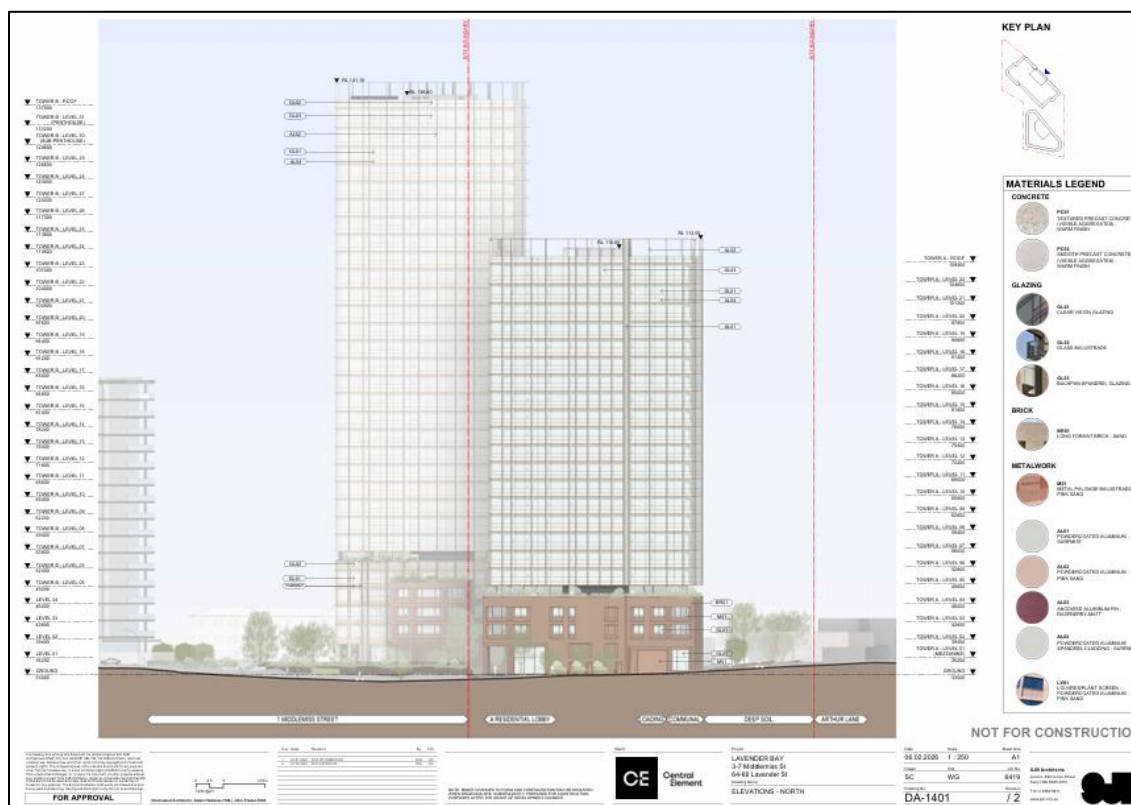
Proposed Site – North- Elevations (Source: SJB Architects)
